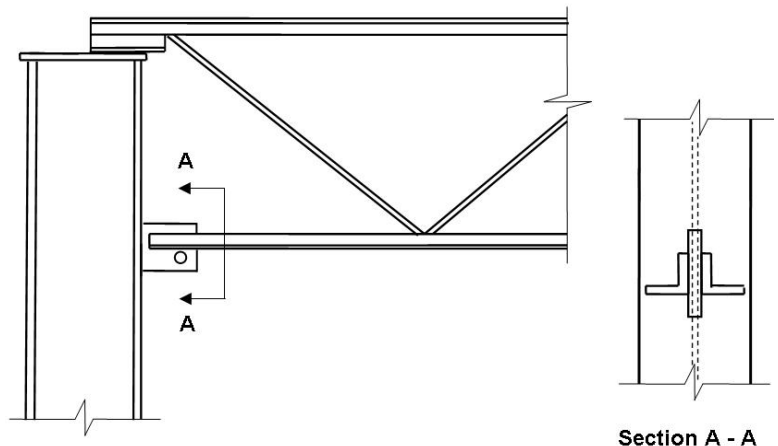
JOIST GIRDER BEARING ON STRUCTURAL STEEL COLUMN WITH VERTICAL STABILIZER PLATE
